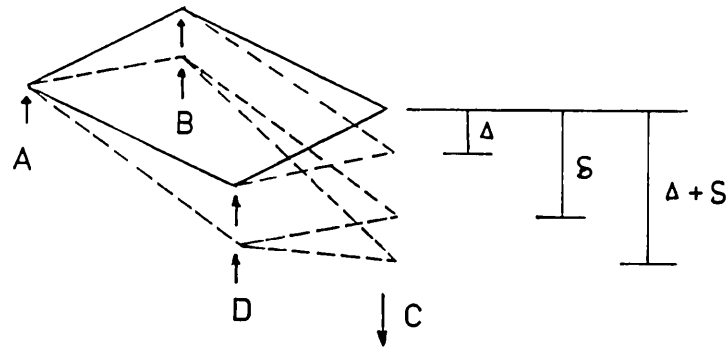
Deformed shape of walls and suspended slab of the four-point-support-system (FPSS).
